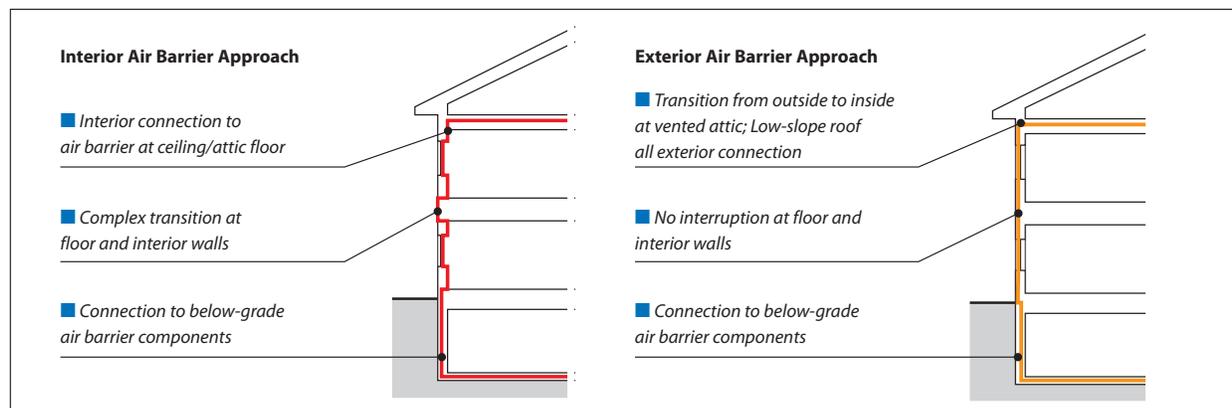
Interior (left) and Exterior (right) Air Barrier System Approach
